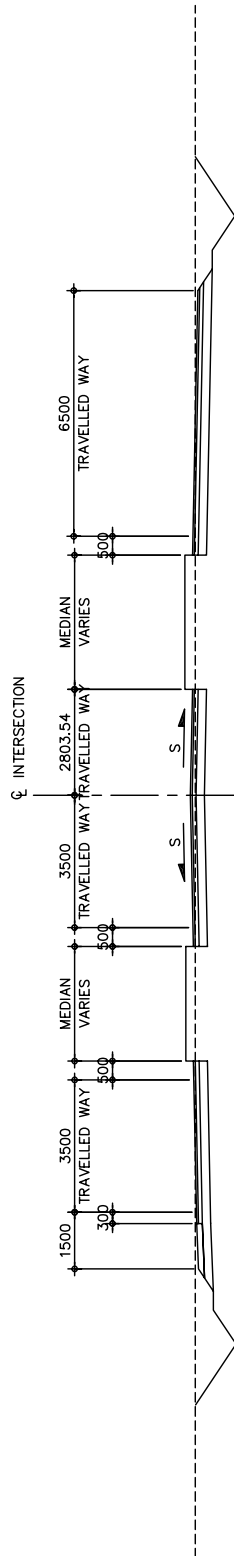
Plan and Profile (Section VI Sta.329+300-Sta.329+549.194)
